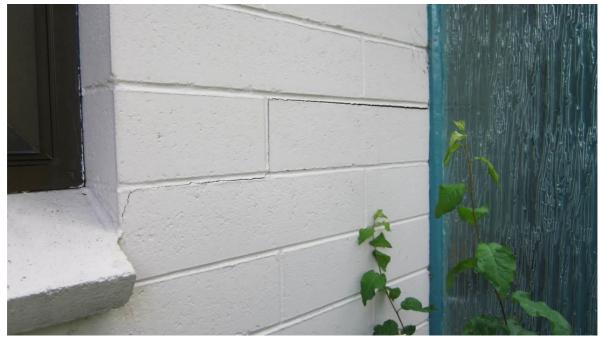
External concrete masonry block veneer of Block C.Damage Description: Cracking in concrete masonry block veneer mortar.
